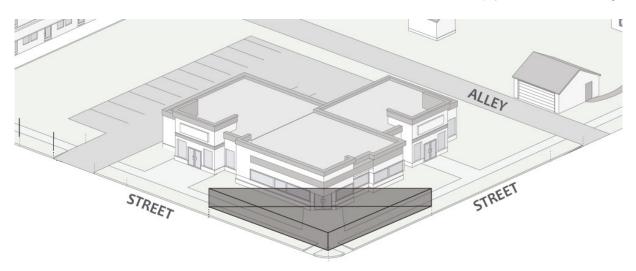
Upper Floor Façade Stepbacks Vision Clearance Triangle
